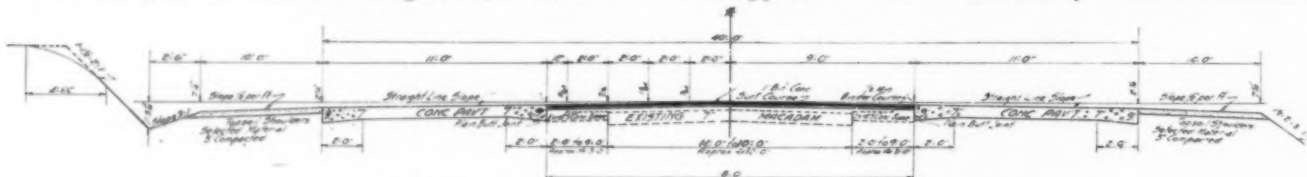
Typical Section Showing Existing Base and Concrete Widening
